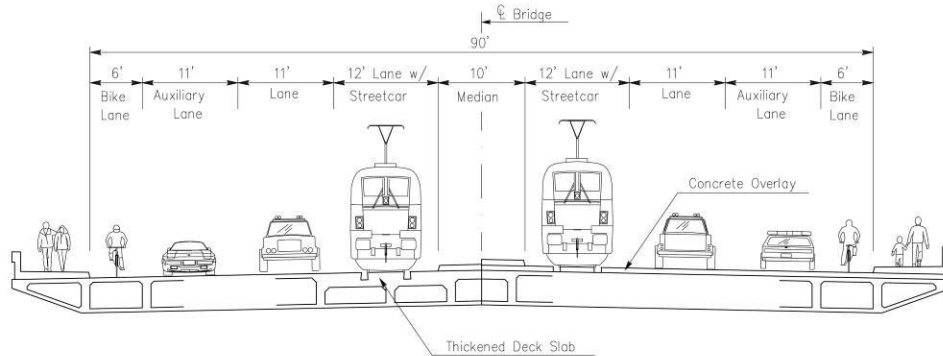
Typical Section of Capitol Mall Separation showing lane configuration Alternative 2 - one through, one auxiliary and one mixed-flow traffic lane in each direction, with median and shoulders/bike lanes.
